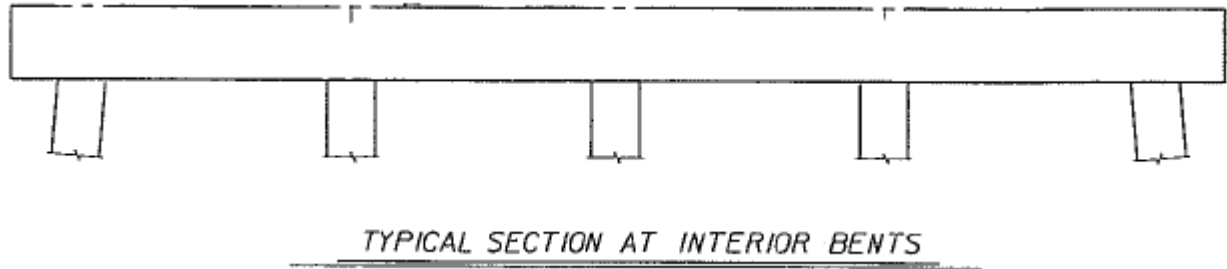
Ernest Lyons West Island Access Bridge typical pile bent
